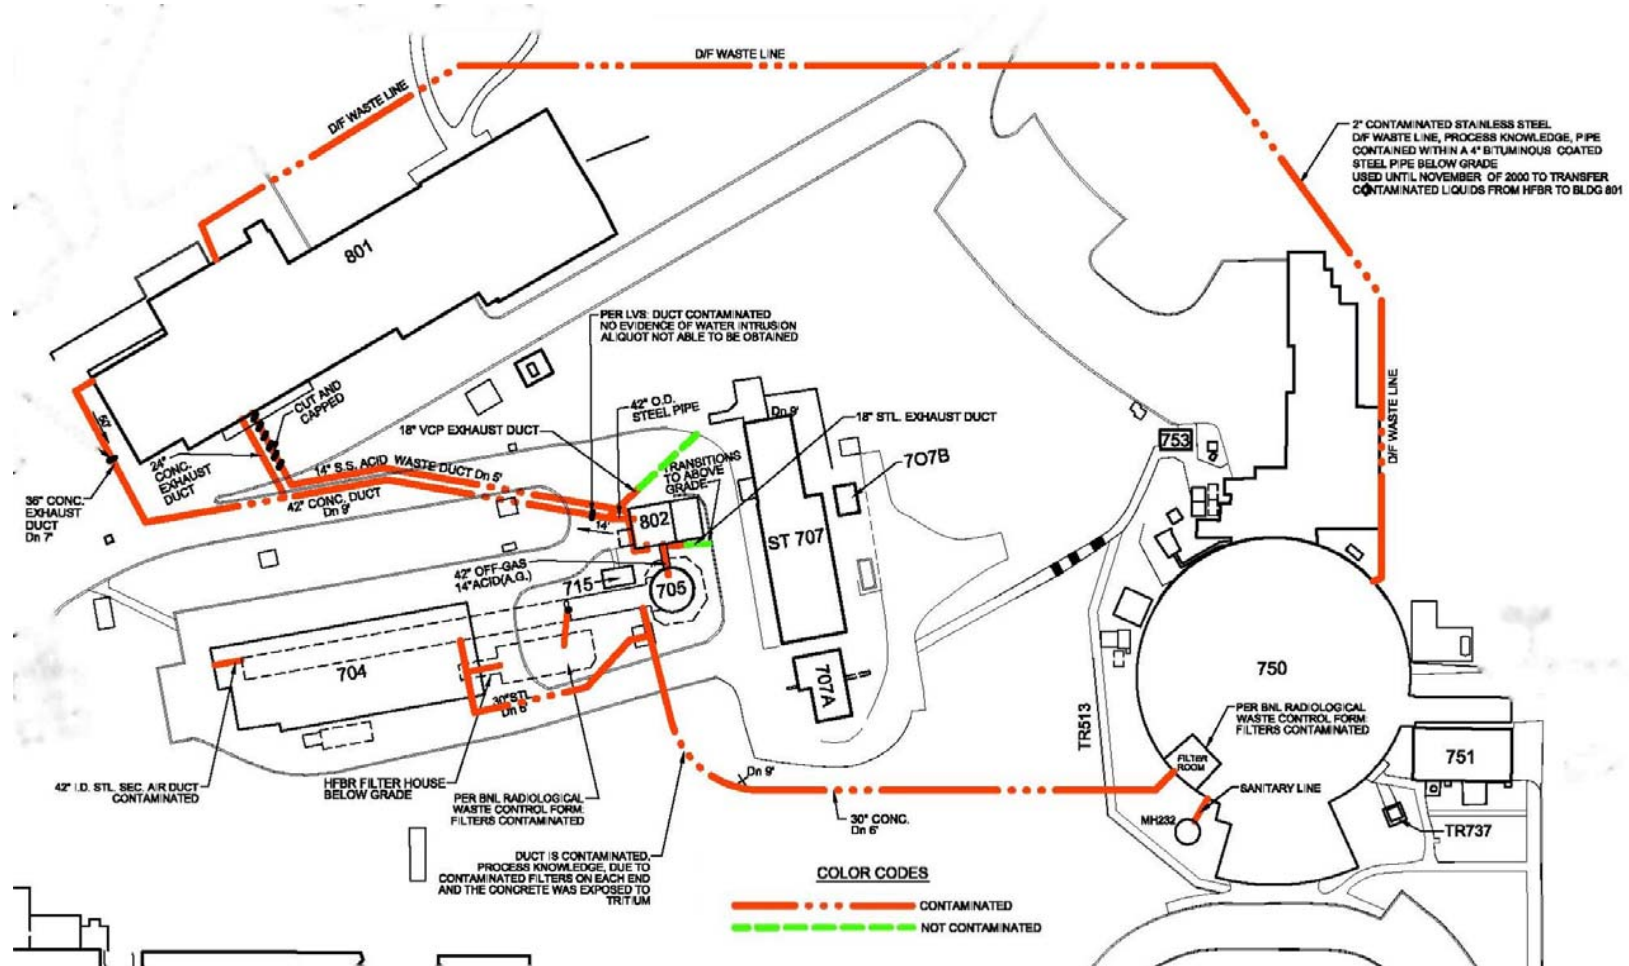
HFBR Site Plan, showing location of D/F-Waste Line
